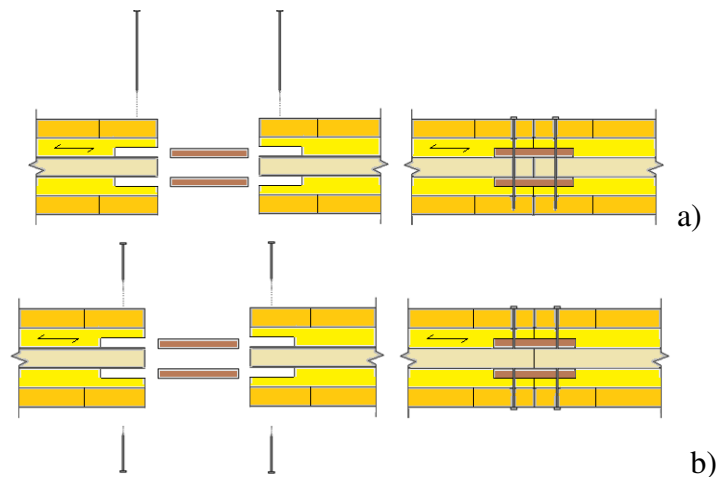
Double internal spline solution for aligned wall-to-wall or lateral floor-to-floor connections: a) with full length fasteners; b) with partial length fasteners (single shear planes).
